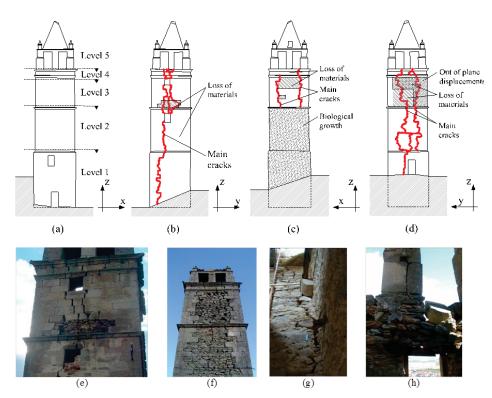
Damage in the tower: (a) South, (b) East, (c) North and (d) West façades; cracks on the (e) East and (f) West fronts; (g) inner crack in the West façade; and (h) example of material loss [44].
